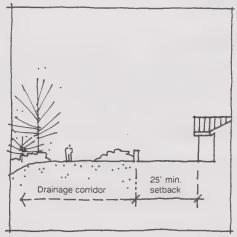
Set back buildings 25' from the edge of drainage corridors.
